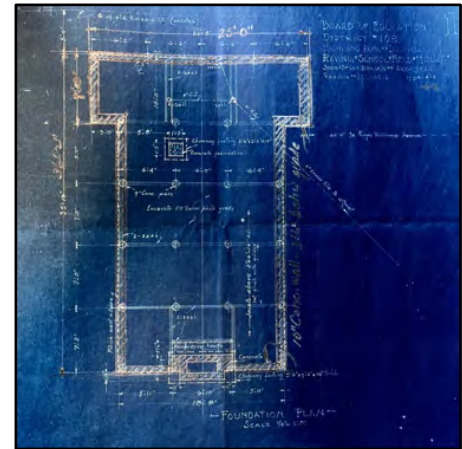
1934 Floor plan for Warming Hut by John Van Bergen. From Ravinia School Archives.
